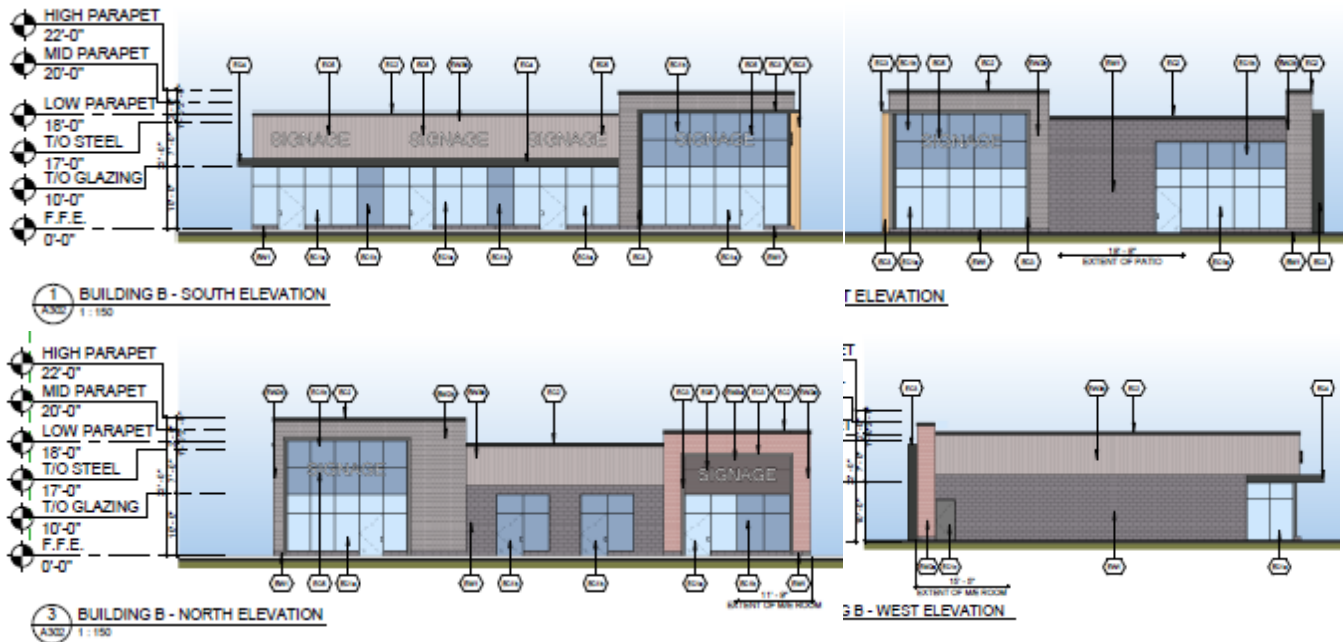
Elevations of the proposed CRU (Clockwise from top left: South, East, West, and North)
